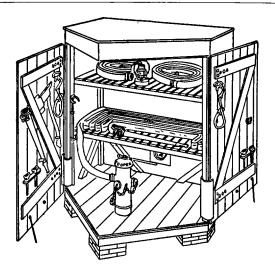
Typical Wooden Hose House. For equipment details see Sections 55, 56, 57, and 58
